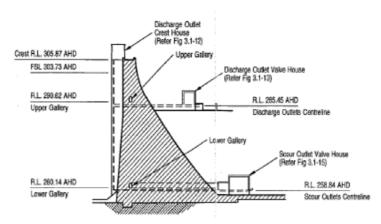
Cross-section of the Cordeaux Dam Wall (Source: WaterNSW, 2015b)
